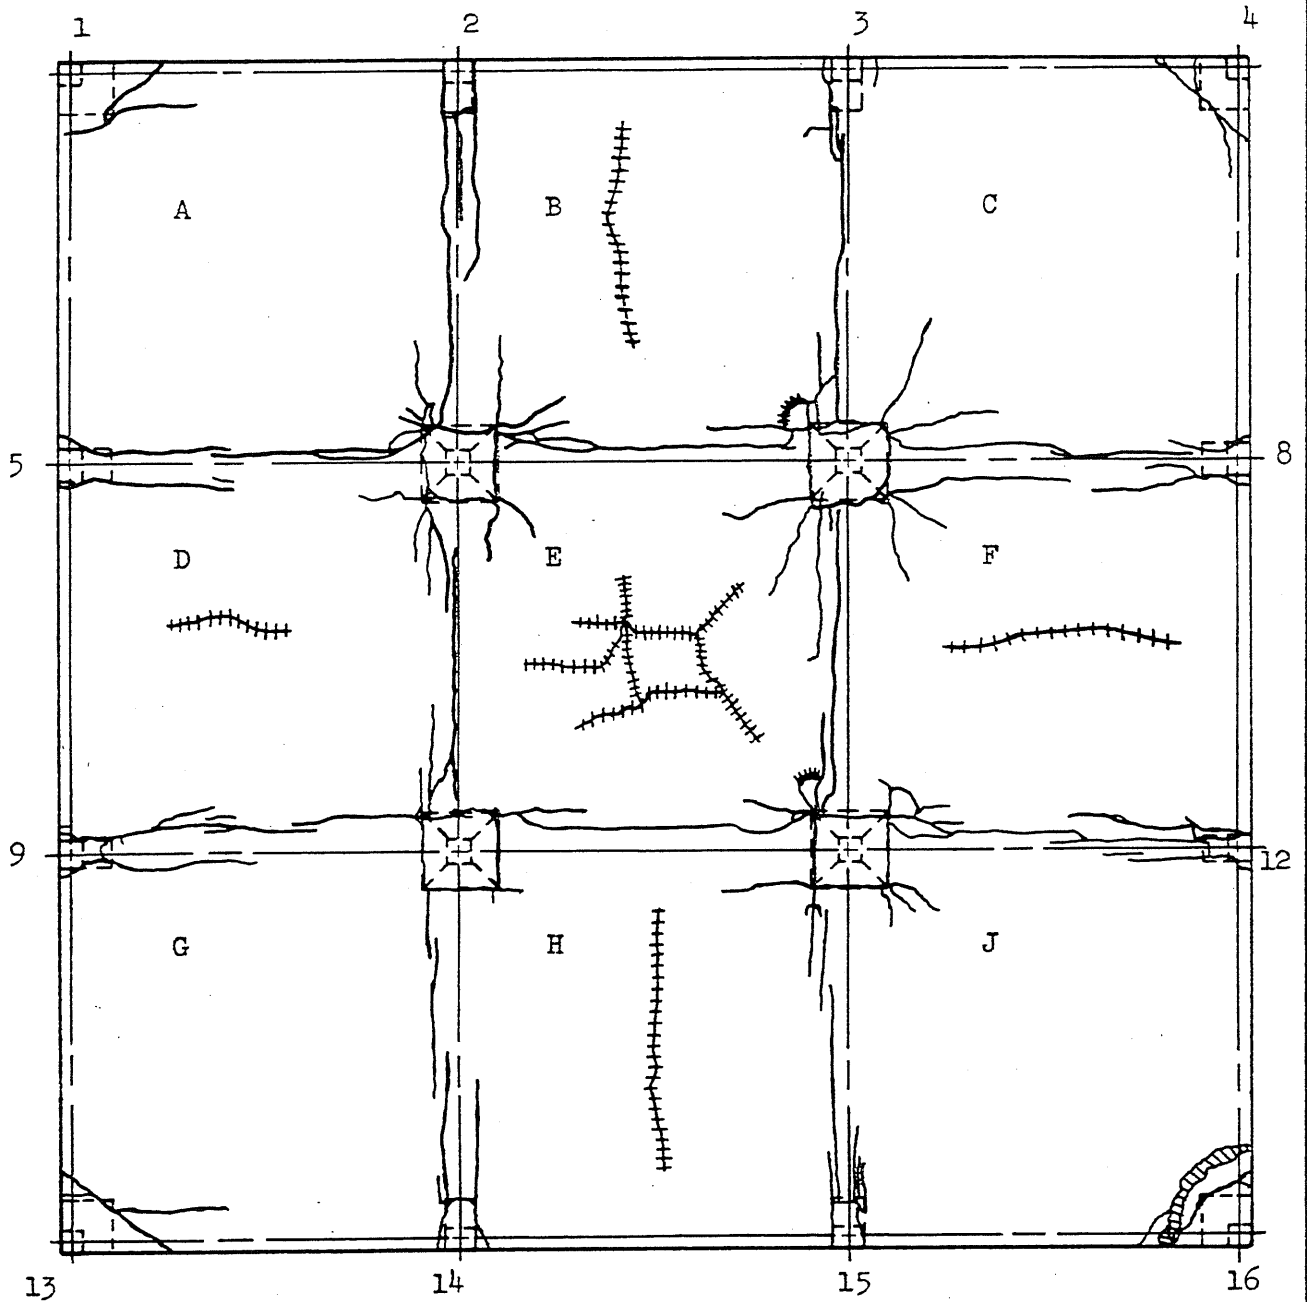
CRACK PATTERN ON TOP OF SLAB F6 AFTER TEST TO FAILURE
